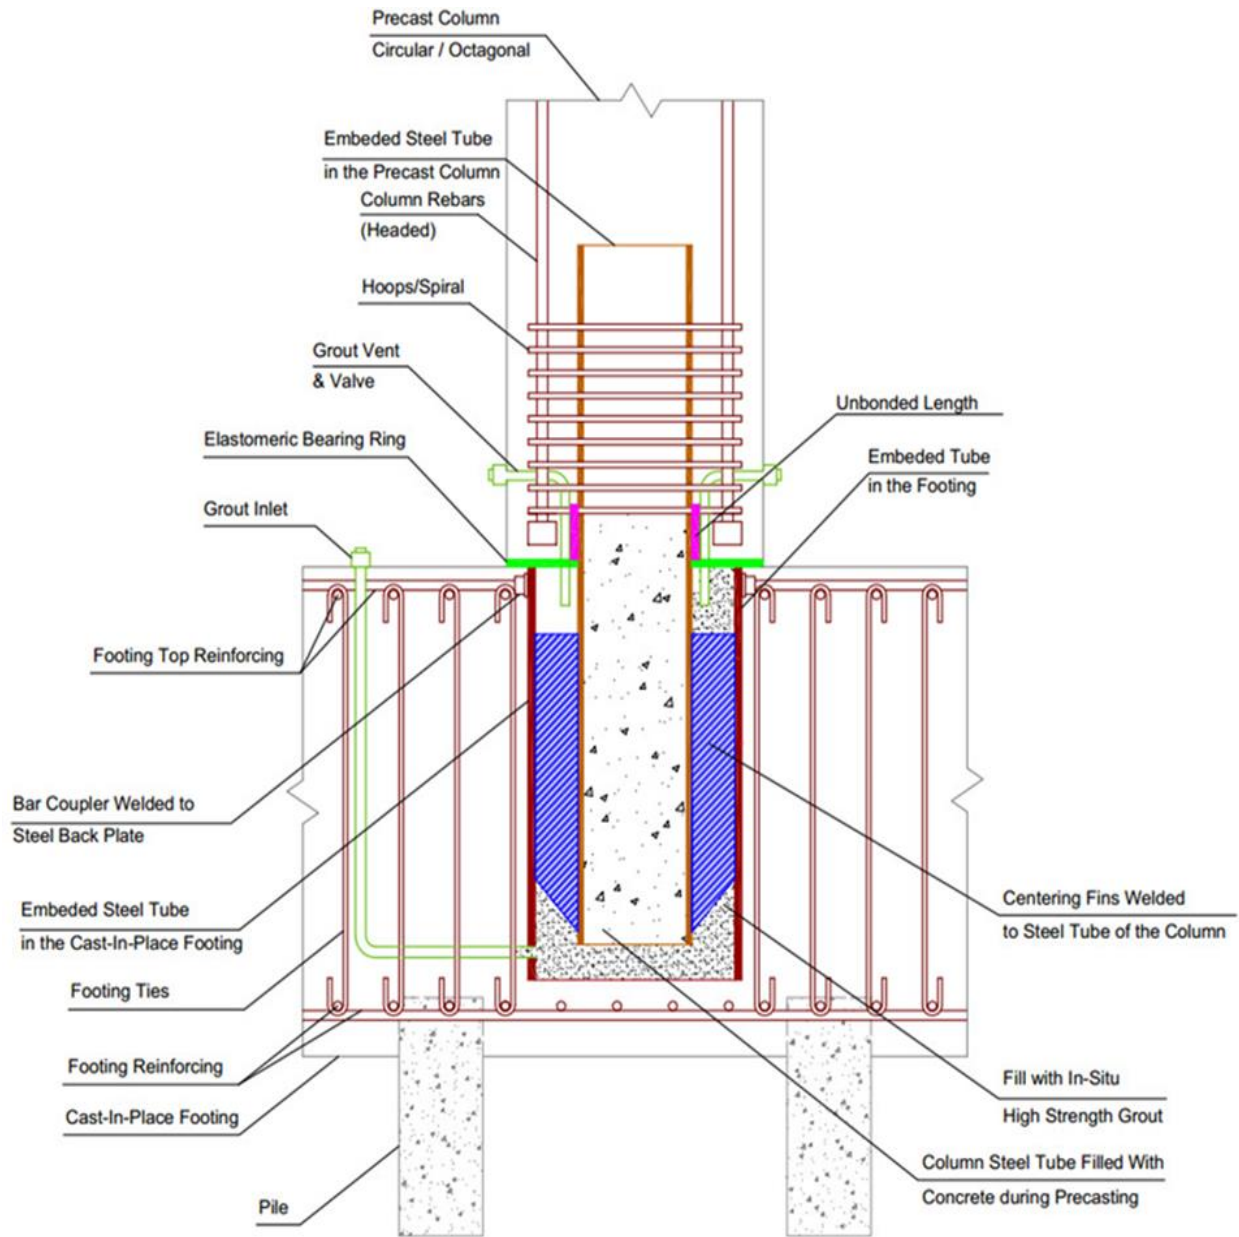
Proposed Connection: Pier-to-Footing Connection
